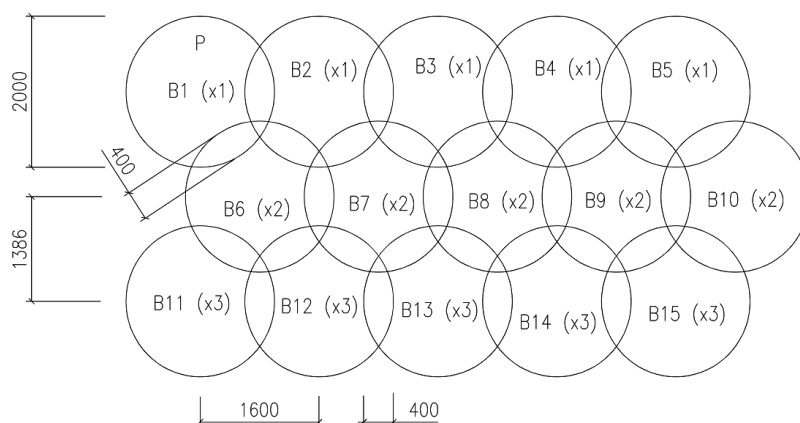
Tentative arrangement of block B DSM trial (with 2.0 diameter columns) with an assumed overlap of 400 mm¹
